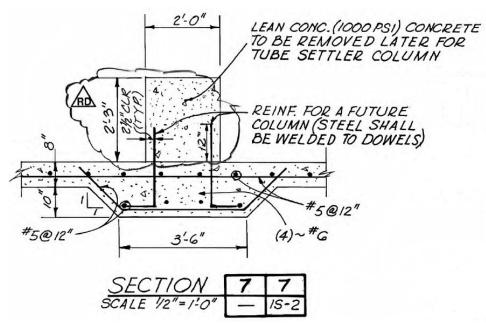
Thickened Footing with Temporary Concrete for Future Column
